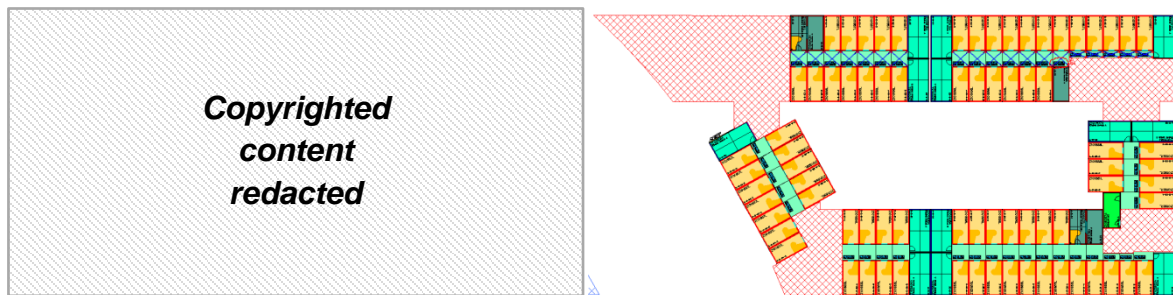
(left): Drawing of architect's building design [Architect 1, 2009]
